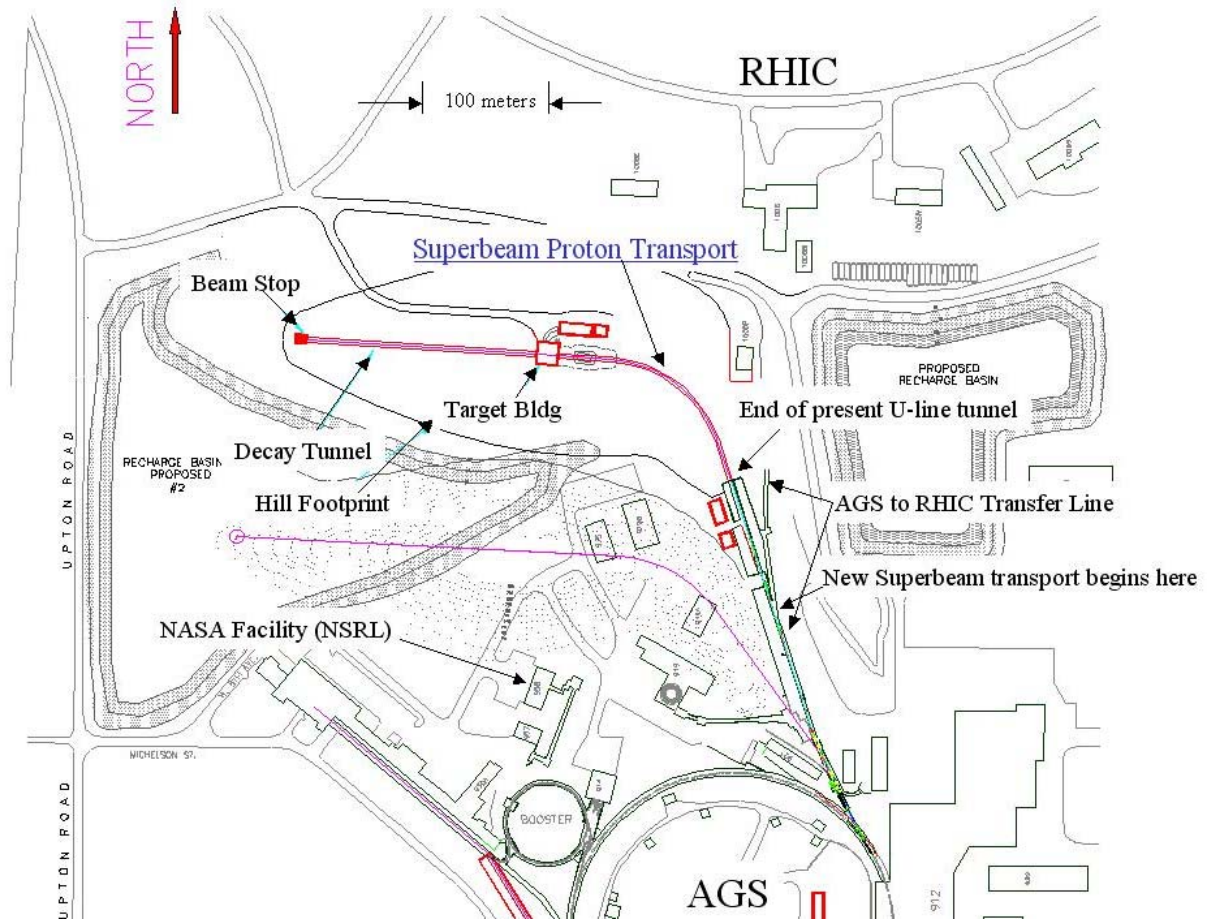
A plan view of the super neutrino beam facility at the AGS. The 1 MW proton beam will be taken from the existing extraction line (U-line) and continued on the upslope of the hill. The vertical and horizontal bending magnet are separate in this plan. The beam will be bent downwards at the top of the hill and directed toward Homestake.
